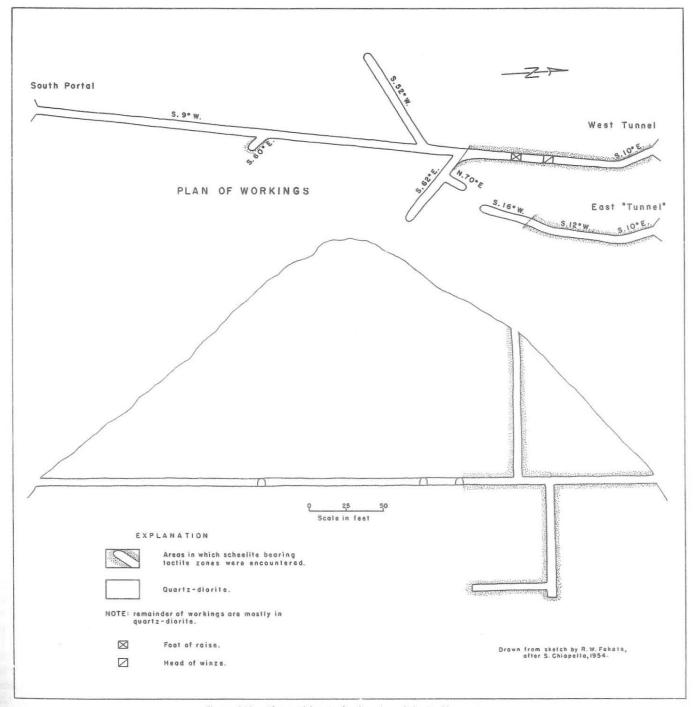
Plan and longitudinal section of the Buckhorn mine.
